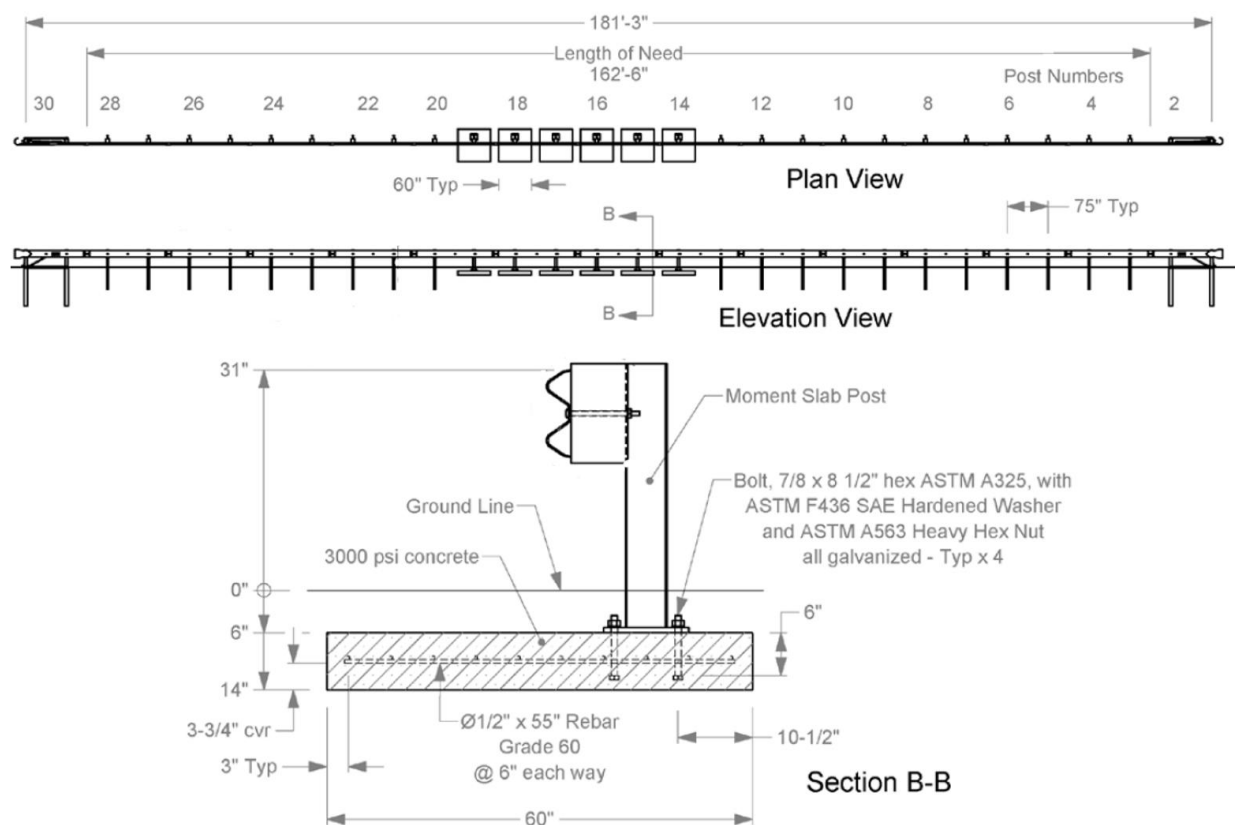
TTI Guardrail System with Posts Attached to Unconnected Concrete Slabs (2).
